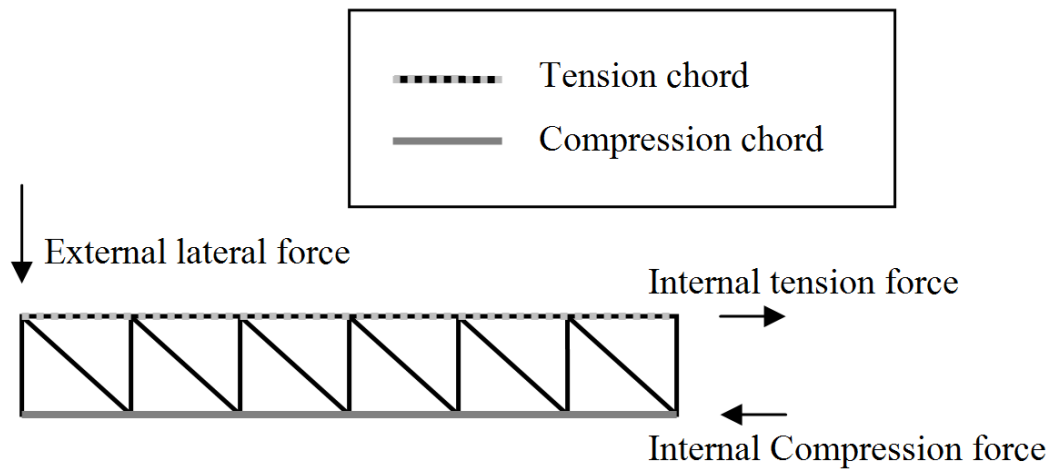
Truss model of a cantilever beam subjected to lateral force.
